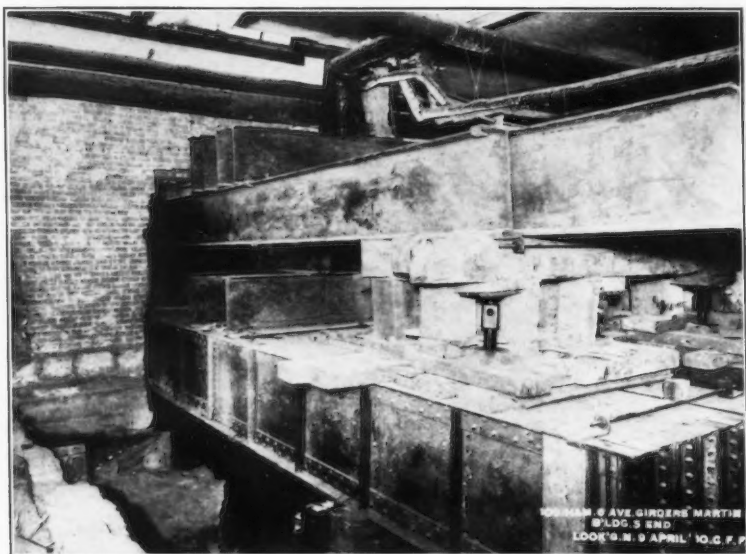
STEEL UNDERPINNING OF A COLUMN OF THE MARTIN BUILDING.
